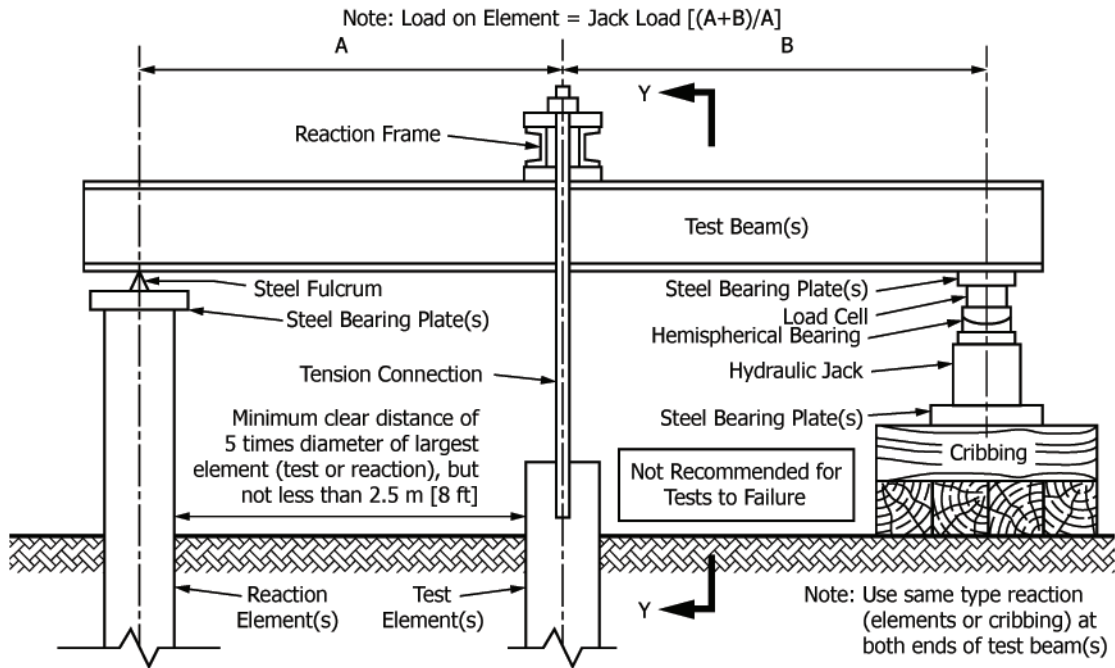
Typical Setup for Tensile-Load Test Using Hydraulic Jack(s) Acting Upward on One End of Test Beam(s)
